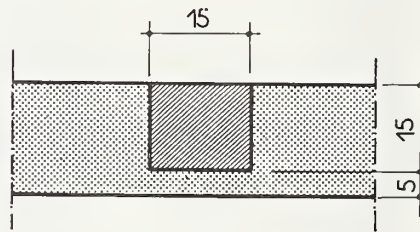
Light wall. Example of correction of a thermal bridge produced by internal framing
